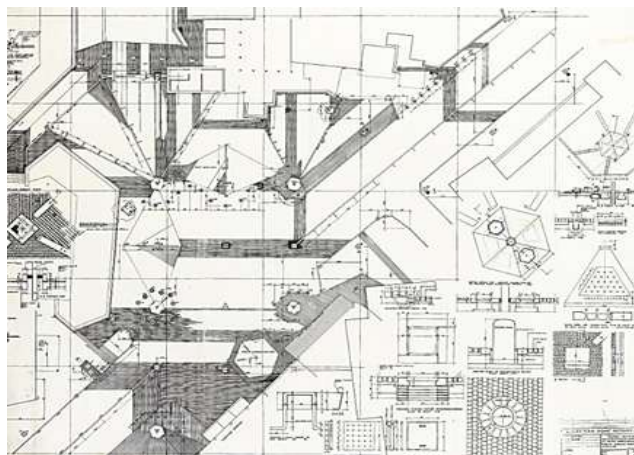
A collection of detail drawings for the pavement and manholes in the lower square [27].
